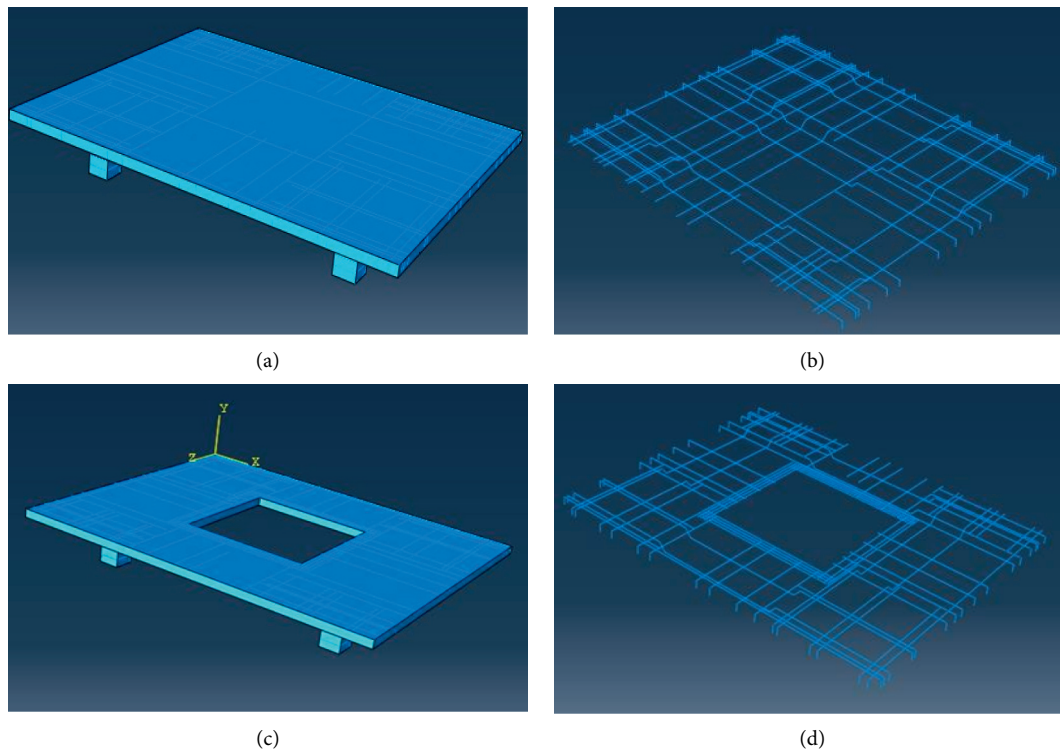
(a) Geometric model of a flat slab without opening, (b) embedded reinforcement of the flat slab without opening, (c) geometric model of a flat slab with opening, and (d) embedded reinforcement of the flat slab with opening.
